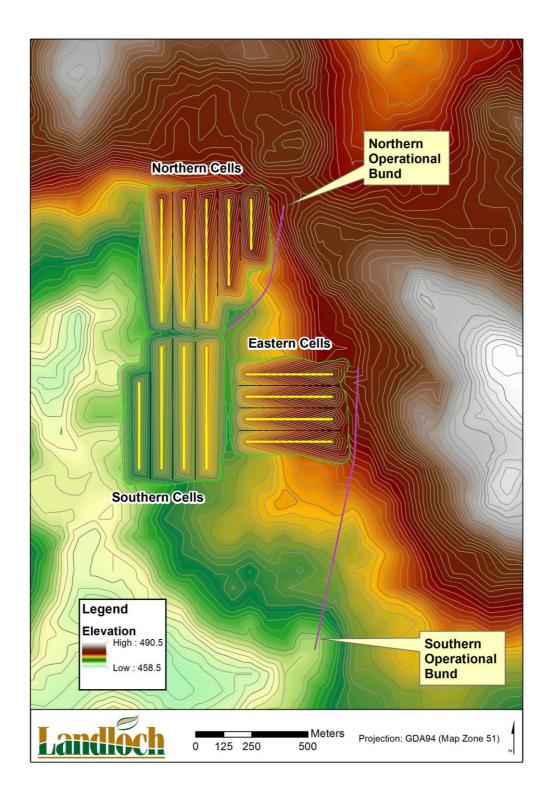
Proposed layout of the Sandy Ridge waste facility cells.
